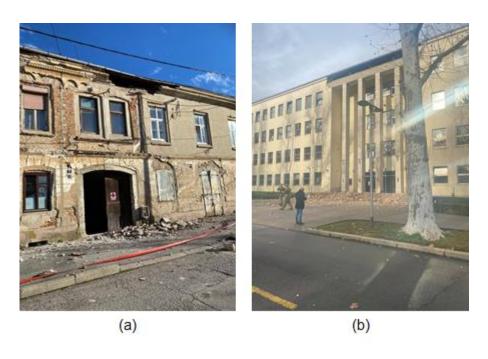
Fallen façades and parapets (source: 24sata.hr).
